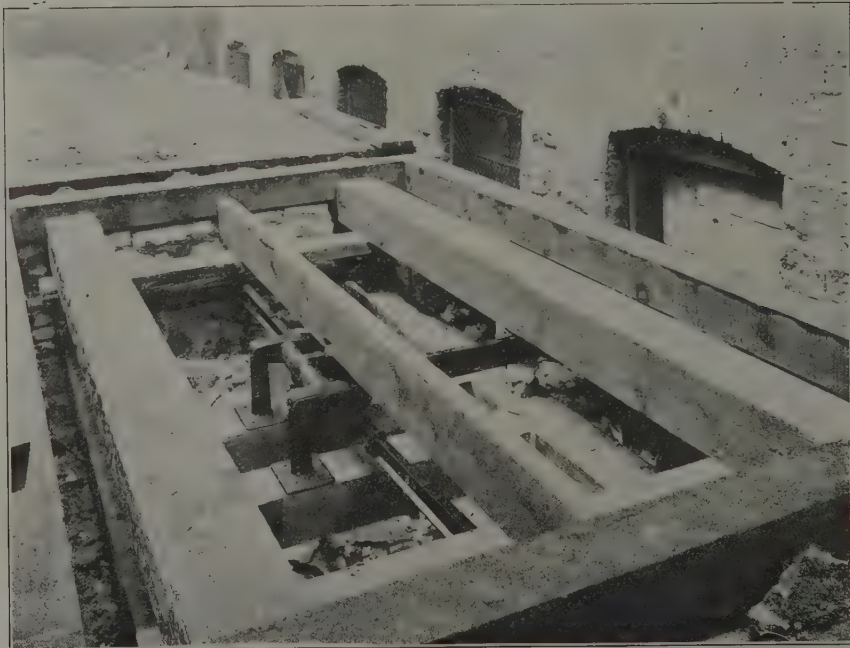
Rubble Stone Foundation with Extra Heavy Timbers.
